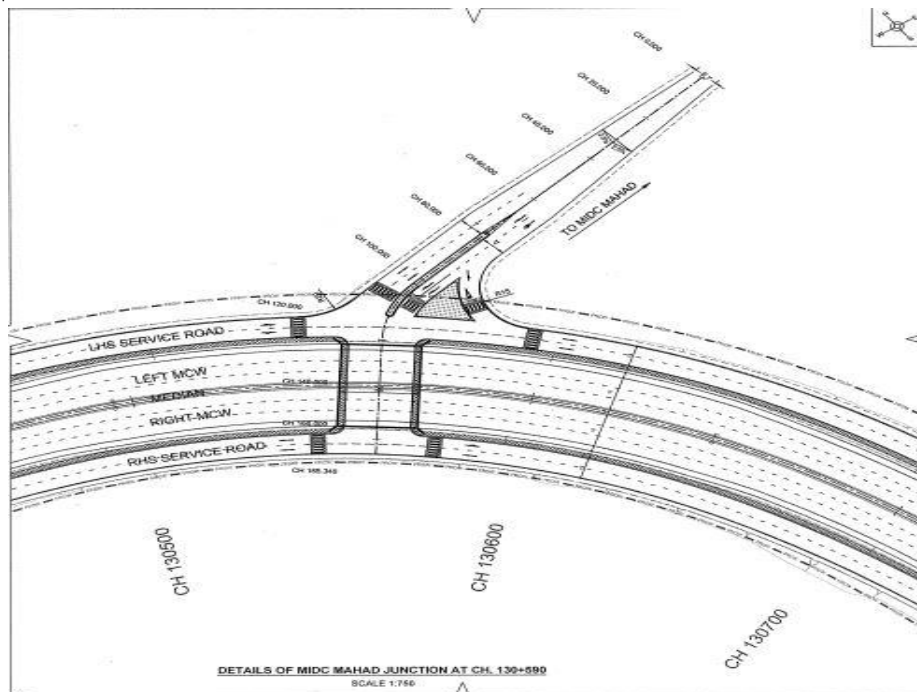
Plan layout of 3 legged T-Type Major junction
